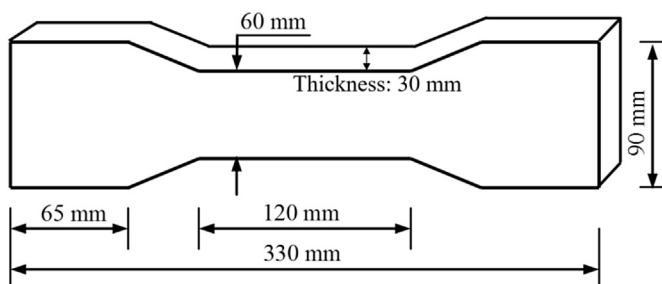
Geometry and dimensions of the dumbbell specimens.
